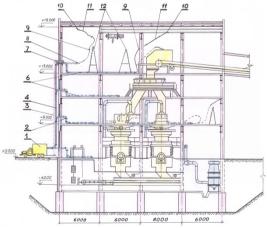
Layout of pipelines inside a premise: 1 - mobile dust collector; 2 - pipeline elements (elbows, tees, etc.); 3 - winch cable; 4 - vertical pipeline;
